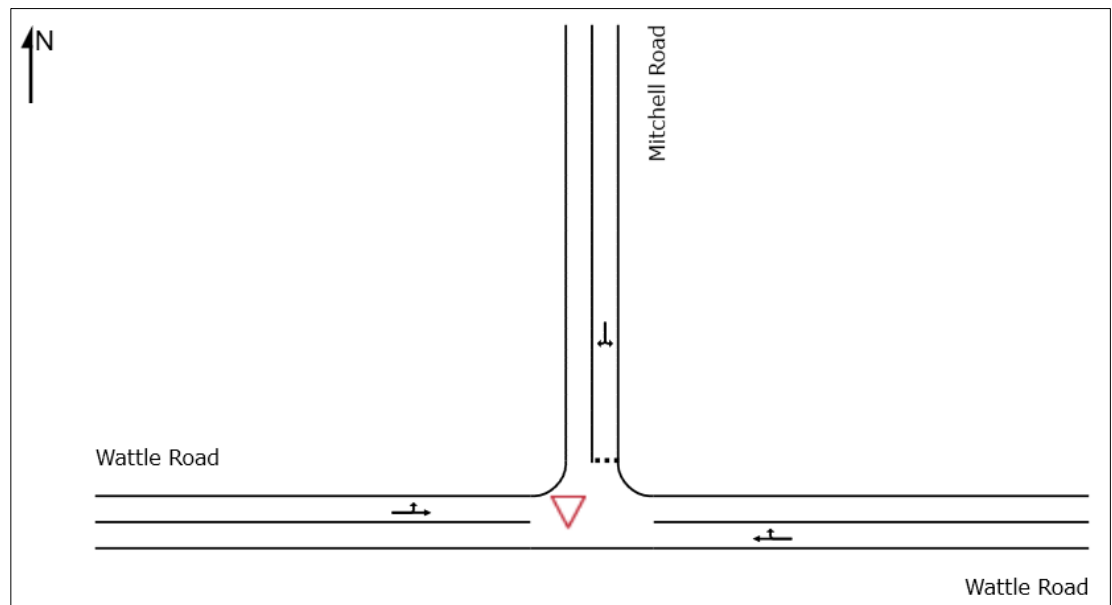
Priority Intersection Layout of Mitchell Road with Wattle Road (SIDRA)
